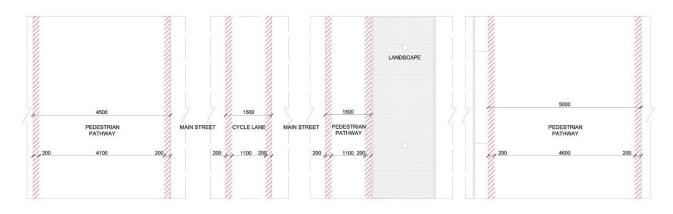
Street width and buffer spaces (in mm) for Gateway 11 in the area surrounding Luisenplatz in Darmstadt
